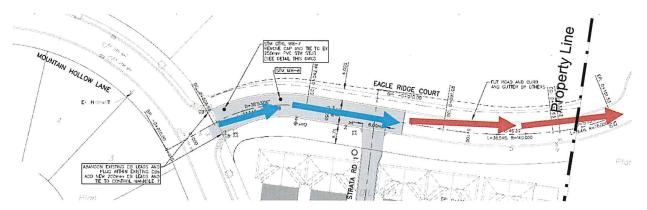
Proposed Access from Mountains Hollow Lane to Subject Property
